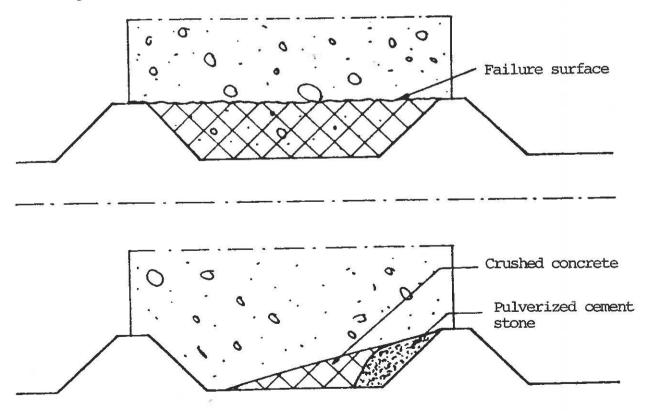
Failure states of the interaction between the deformed bar and the concrete in standard concrete with single rib spacing /3/.
